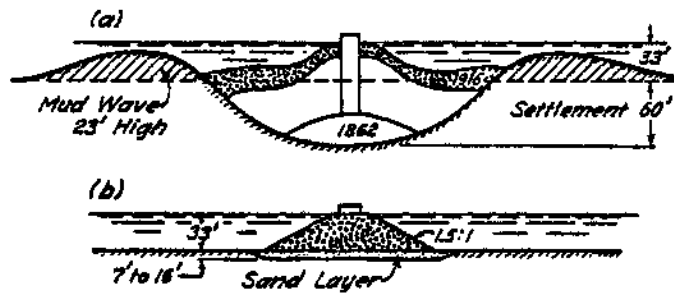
Rock-fill Breakwater, Spezia, Italy, Constructed
